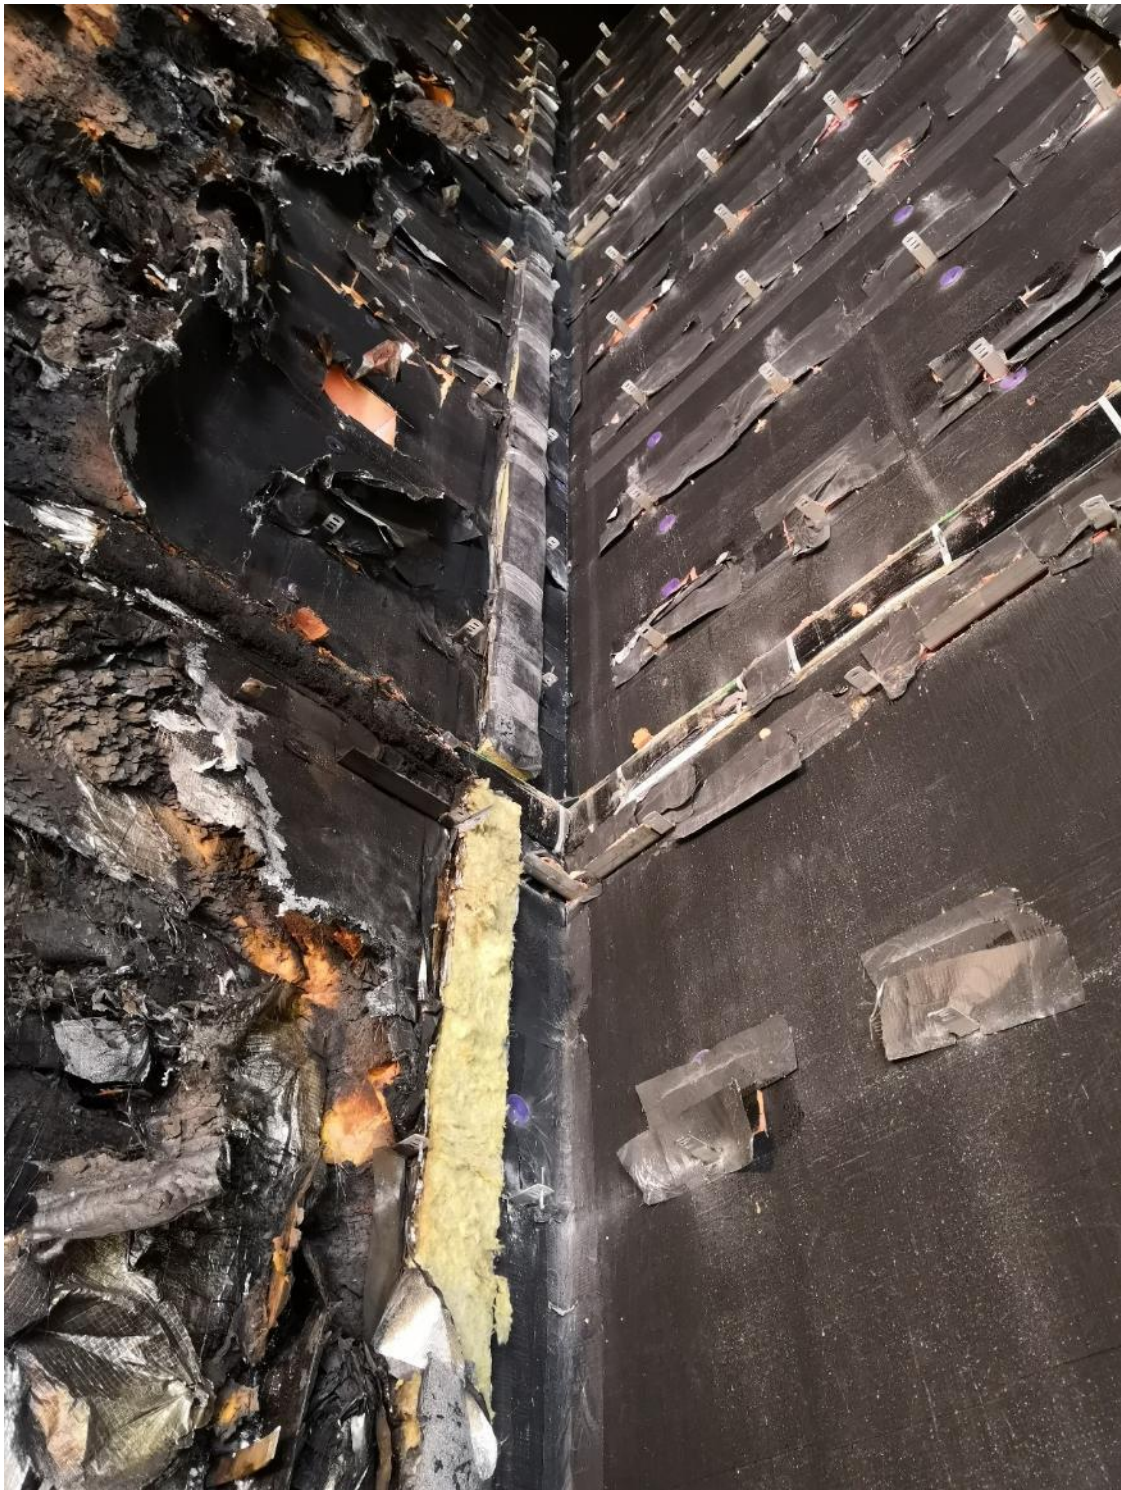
Post-examination damage. Vertical fire stop barrier located on the corner of the system. Damage observed up to first horizontal fire stop barrier; rest in place without any damage.
